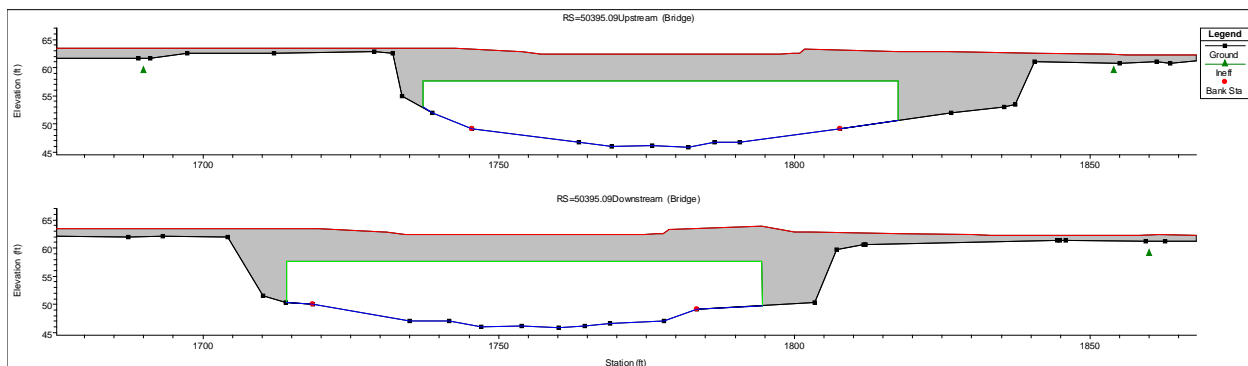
Cross Section of Modified MBTA Bridge in PR4
